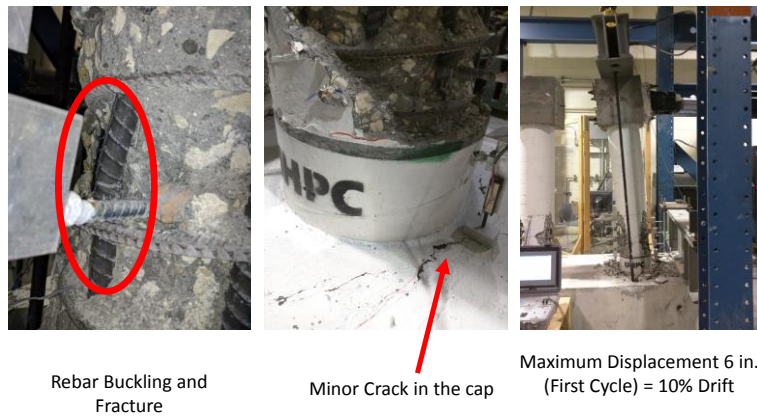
Failure pattern, longitudinal rebar fracture and location of the plastic hinge in the S-5-8.
